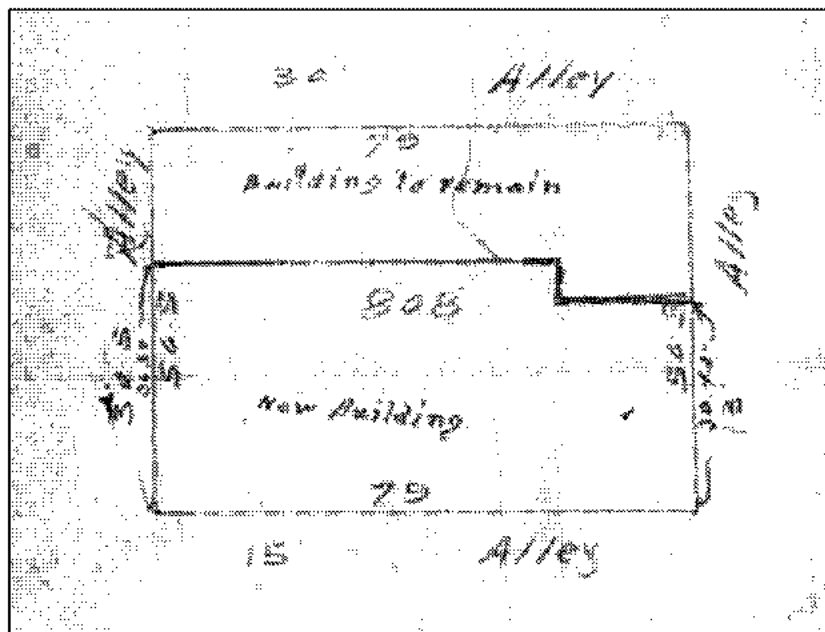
Detail, plat of proposed building addition in Lot 808. Permit to Build No. 129415, November 21, 1929. National Archives and Records Administration.
